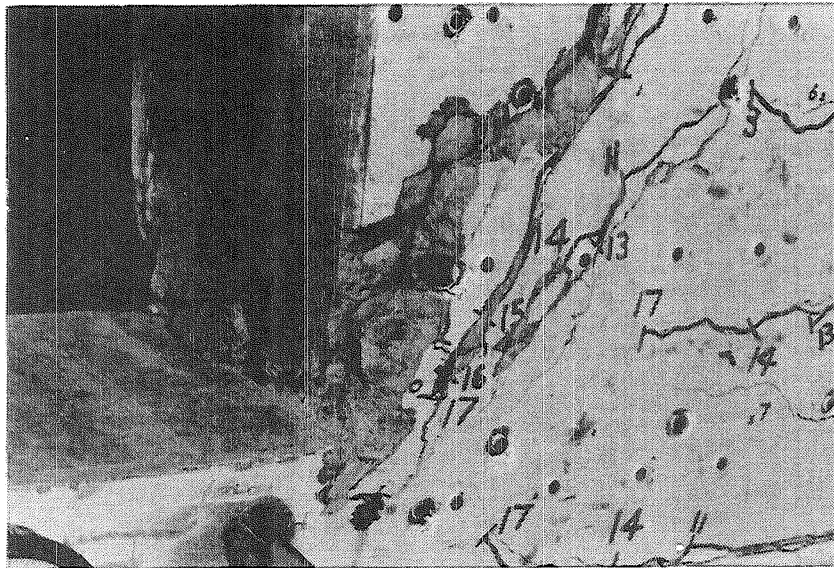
Critical Compression Zone of Beam N2-S62 at Failure
